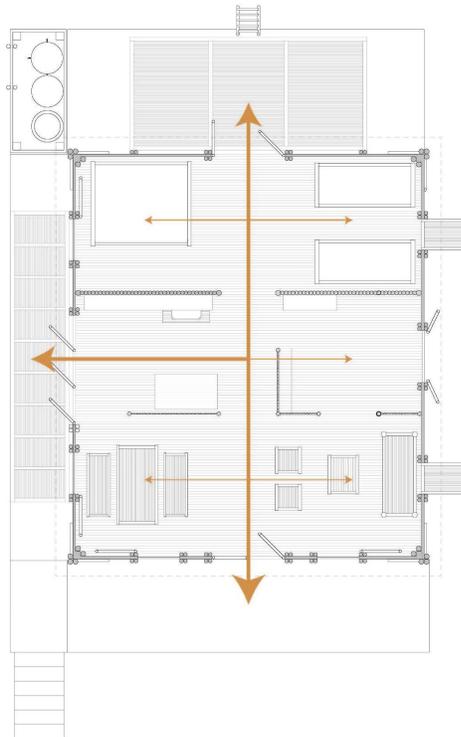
, Proposed Floor Plan: Axis (Source: Author)
